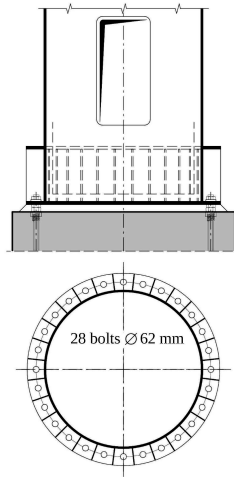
Drawing of bottom part of chimney with manhole position, section and top view, ground plate with anchor bolts at +0.350 m
